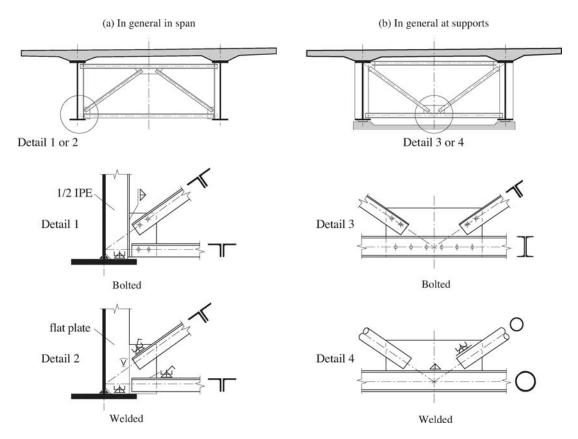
Examples of truss cross bracing for open sections with either bolted or welded connections.
